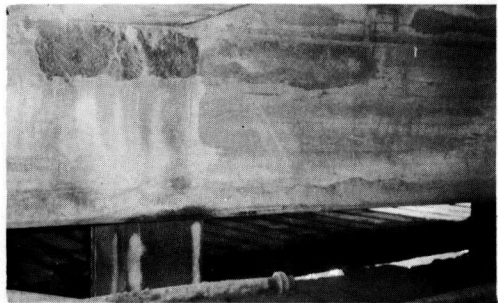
Typical crack in side of pile cap in plane of bottom reinforcement.
